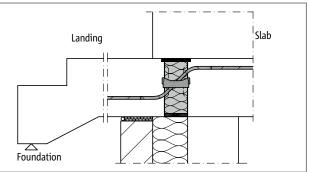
Schöck Isokorb® T type Q-E-V: Stair flight connection
